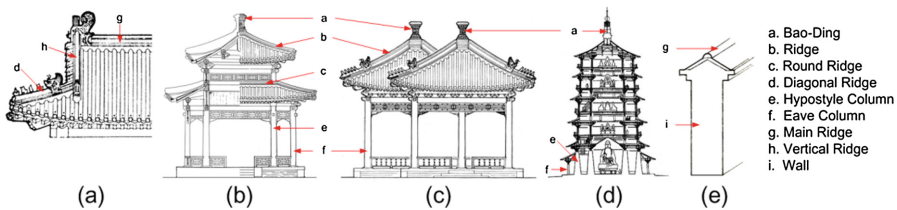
Exemplar structures of (a) A left-half gable-and-hip roof in front-view, (b) A double-eave, (c) A combined ting, (d) A pagoda, and (e) A garden wall.
